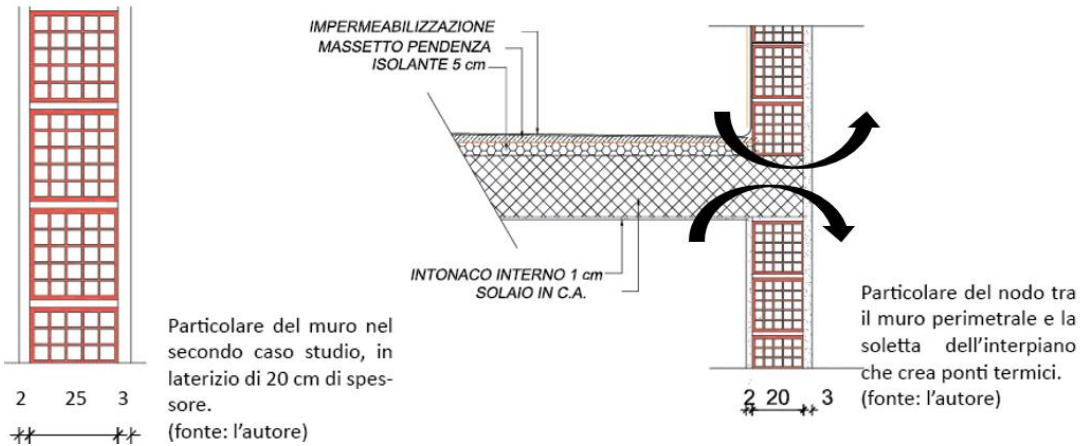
Details of the perimetral wall and the node between the perimeter wall and the intermediate floor.
